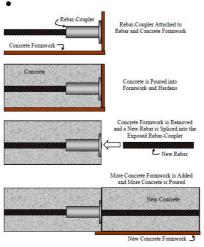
Rebar-coupler continuity of reinforcing across construction joint
